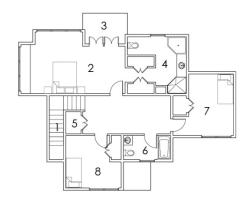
Second Floor Plan - 1. Stair 2. Master Bedroom 3. Deck 4. Master Bathroom 5. Laundry Room 6. Bathroom 7. Jeremiah's Bedroom 8. Spirit's Bedroom
